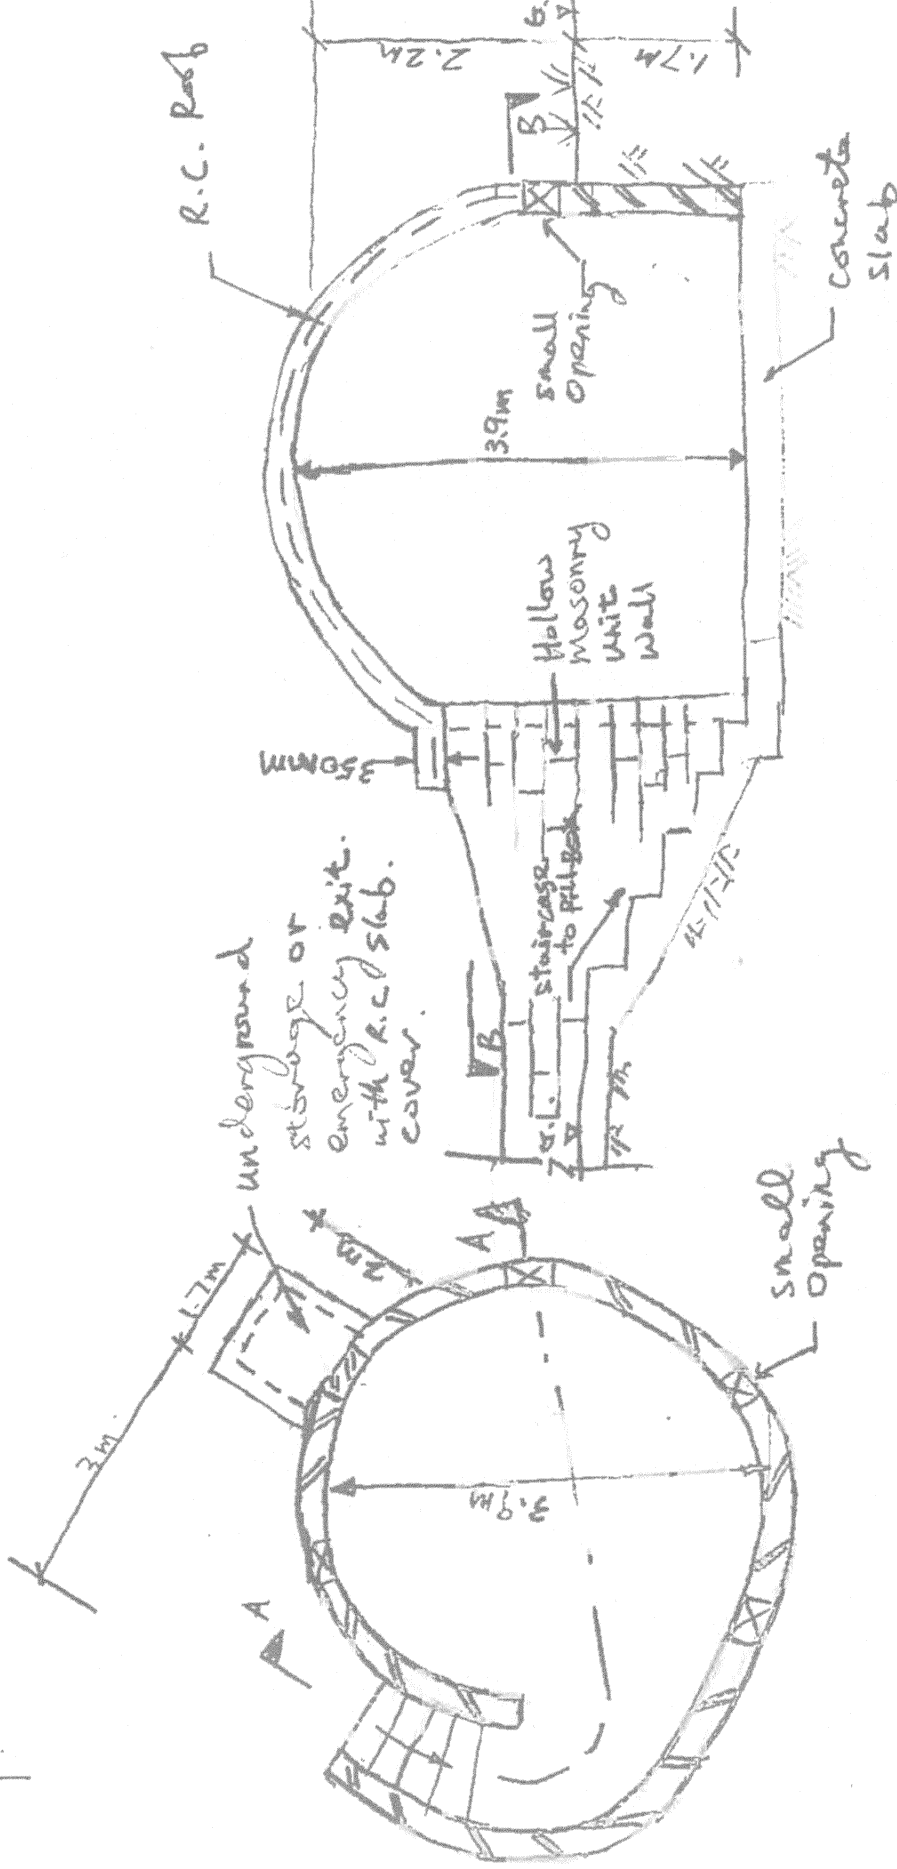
STONE HOUSE (FIRST FLOOR)
